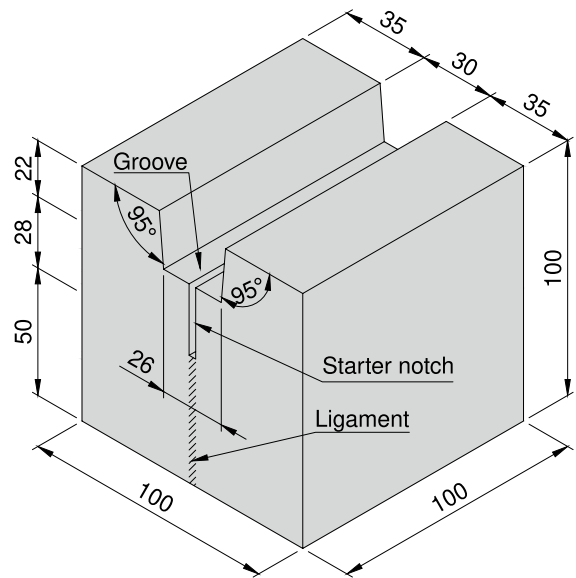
Geometry of the wedge splitting test specimens. Dimensions are given in mm
